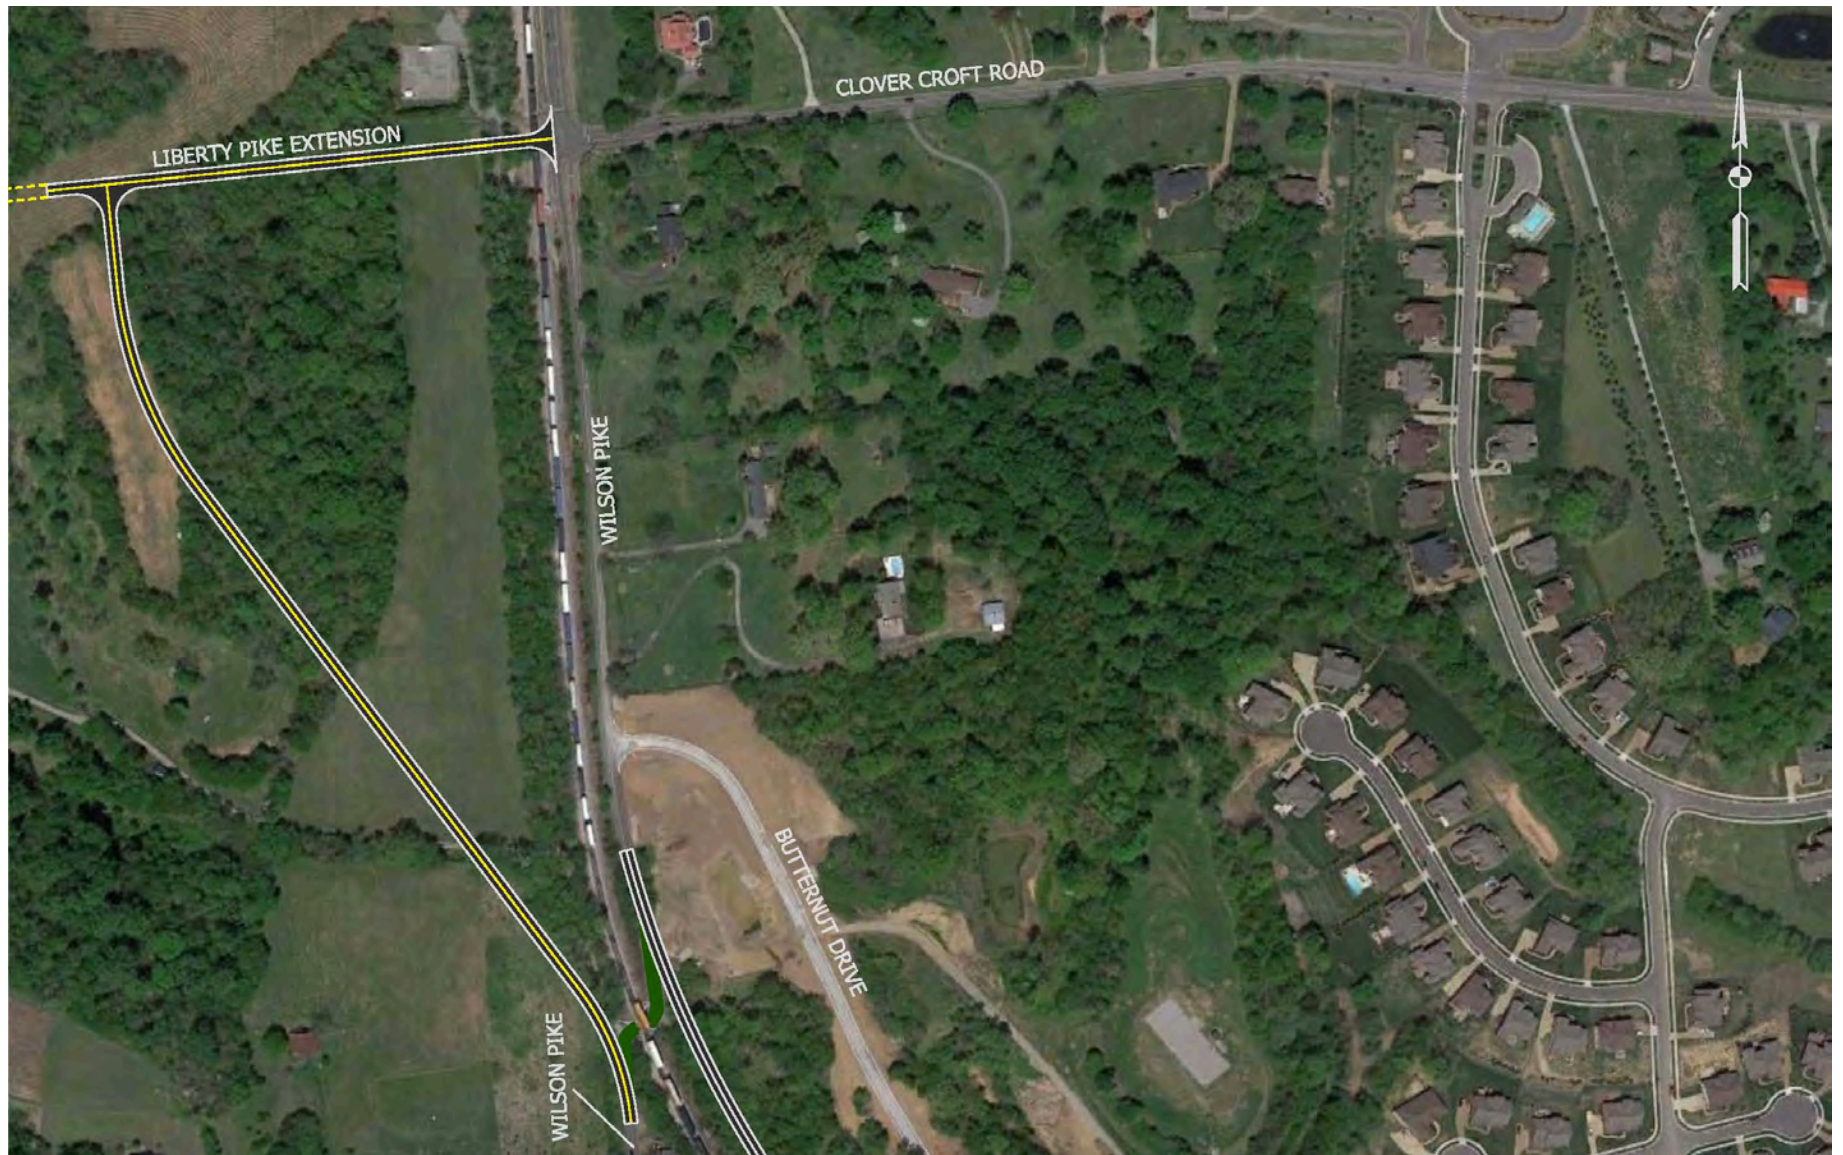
WILSON PIKE LOCAL NETWORK PLAN - DETAIL 1
